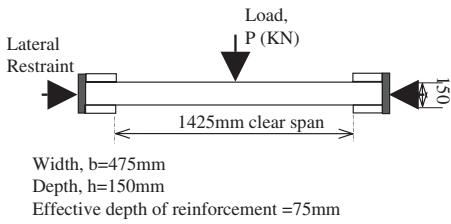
Slab test load arrangement for partial F/E & finite L/R boundary conditions.
